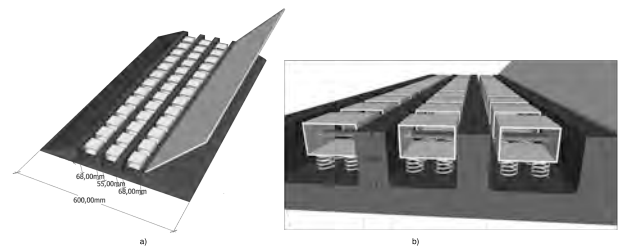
a) Road cavity; b) Detail of the EHD installed inside the speed bump with cavity
